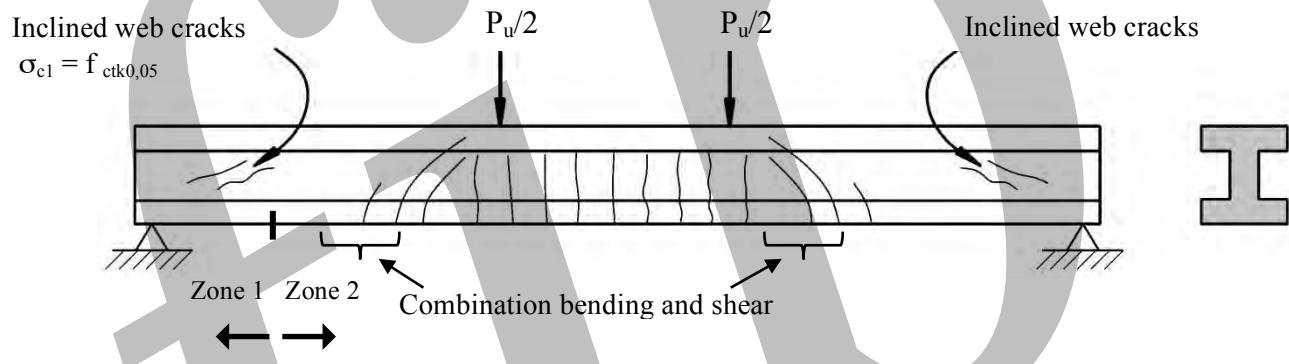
Cracking zones and pattern in a reinforced or prestressed concrete member
